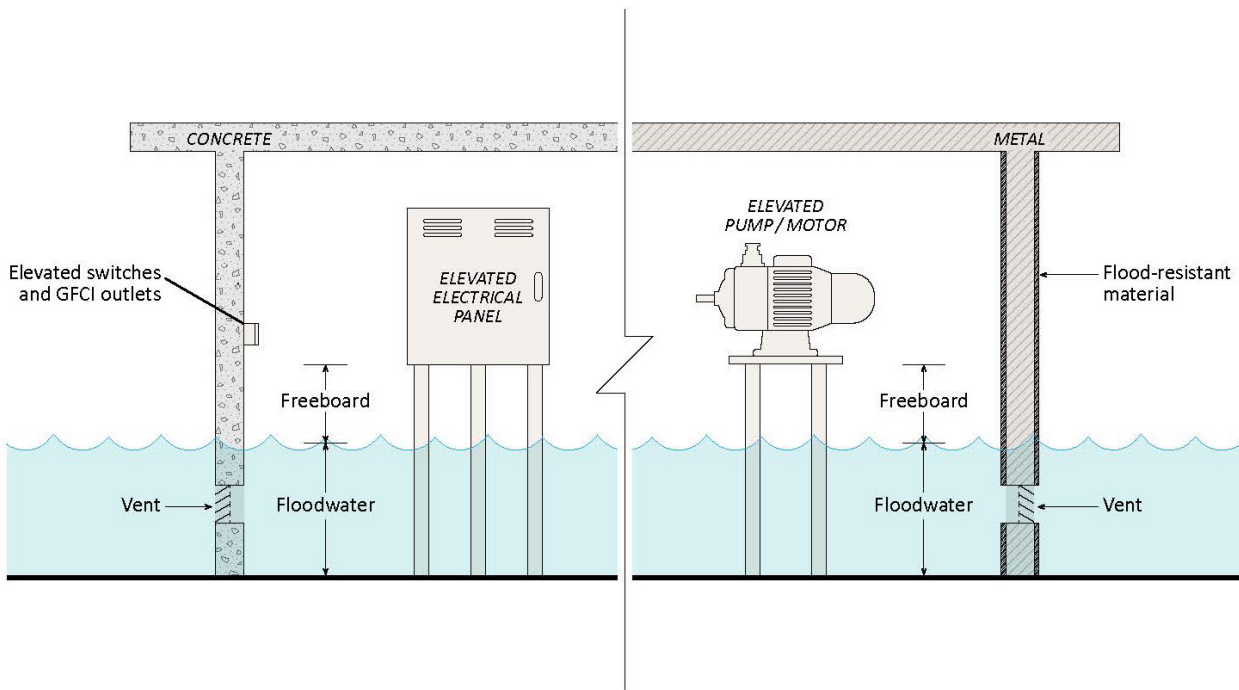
Wet Floodproofing – Elevation of Assets within a Facility
